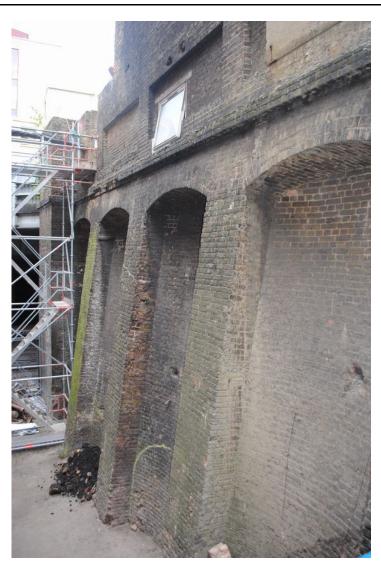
Chimney and retaining walls, former lift shaft to 8-9 Hayne Street
